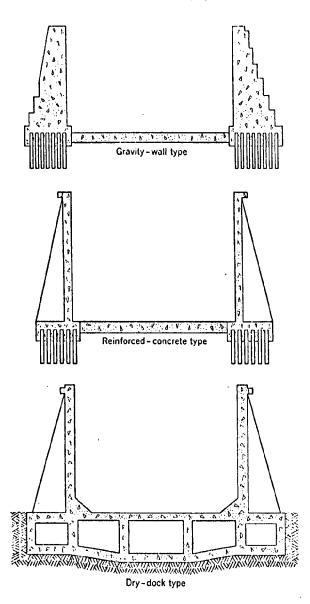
Typical navigation lock sections. (Mathes and Stratton 1956)
